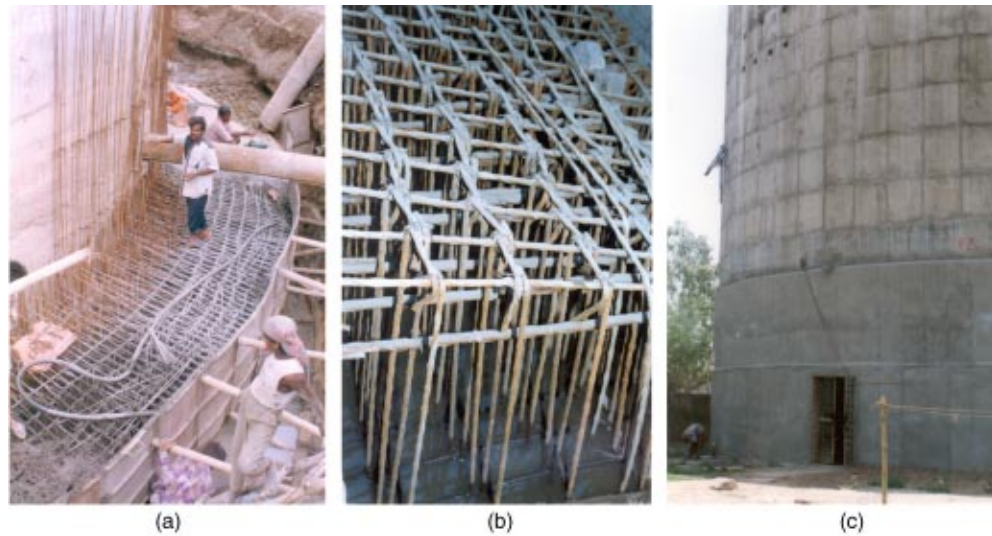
(a) Reinforcement layout for new pile cap and shell jacket, (b) close-up view of reinforcement in pile cap, and (c) the retrofitted shaft.
